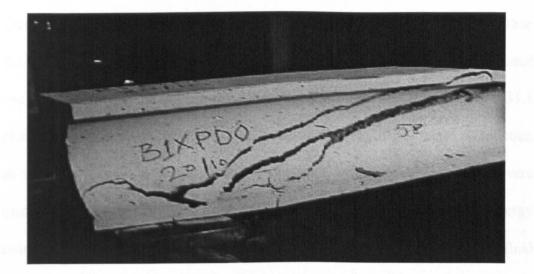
Typical flexural shear crack failure for prestressed X-beams
